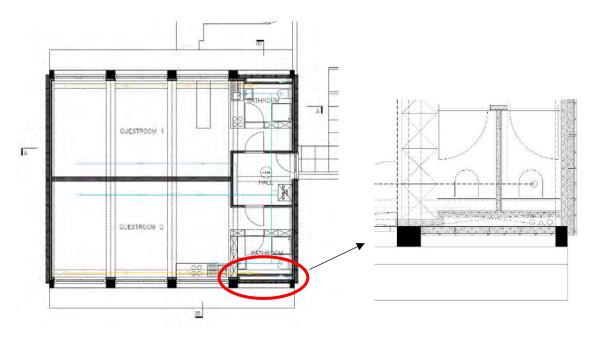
Use and detailing of a technical shaft in the Circular Retrofit Lab
